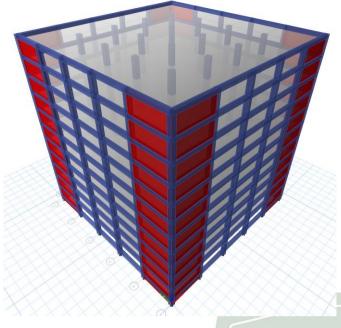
3D model of flat plate with both edge beam & shear wall.
